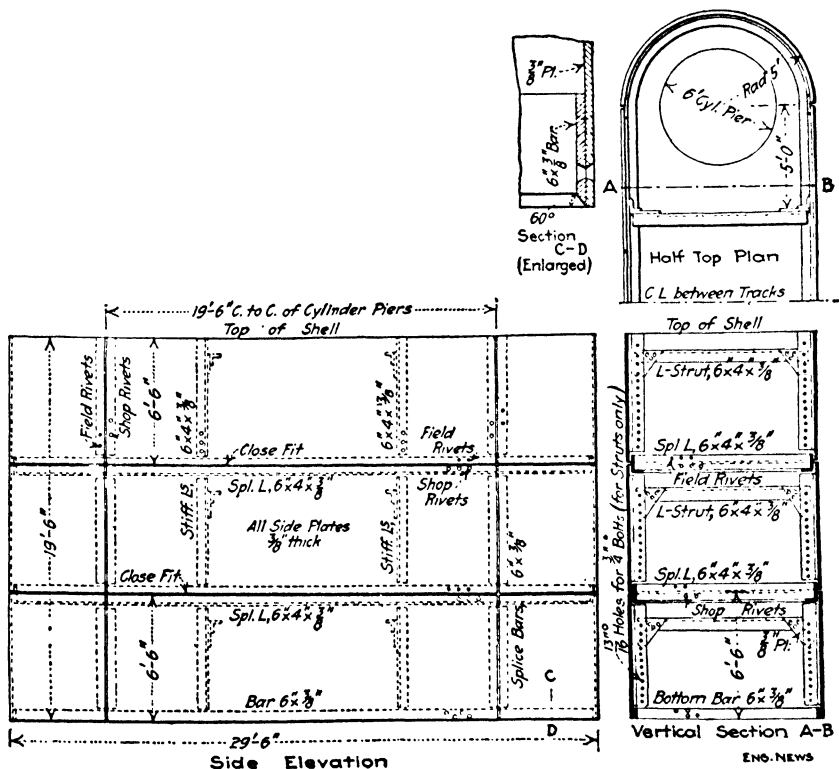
STEEL SHELL FOR BASE OF CYLINDER PIERS OF THE OXFORD MILL POND BRIDGE, CHICAGO & NORTHWESTERN RAILWAY.
